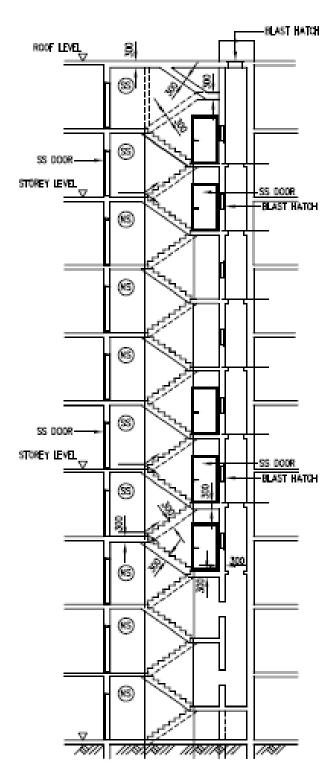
C - Section - Staircase Shelter And Non Shelter, Blast Door And Blast Hatch
